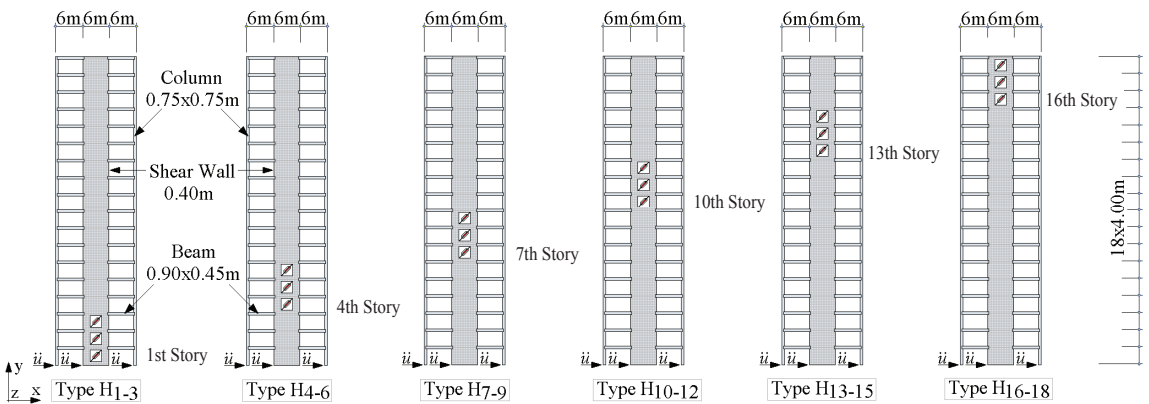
Placement of dampers within 18-story frame-shear wall structures.
